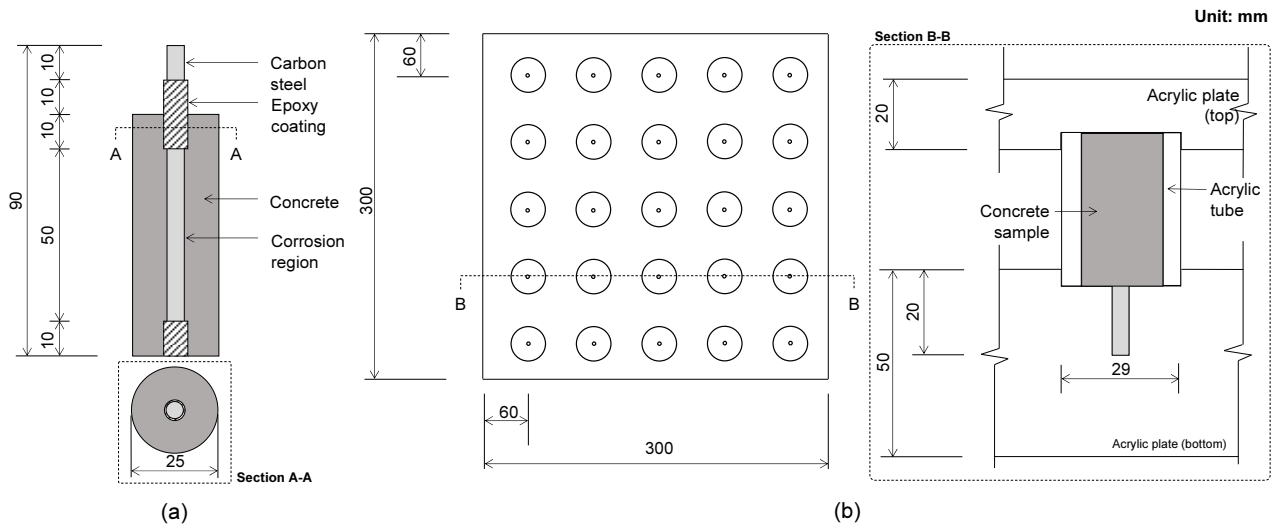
Detail of concrete samples and acrylic molds: (a) section views of the concrete sample and (b) plan and section views of the acrylic mold used for fabrication of concrete samples in this study
